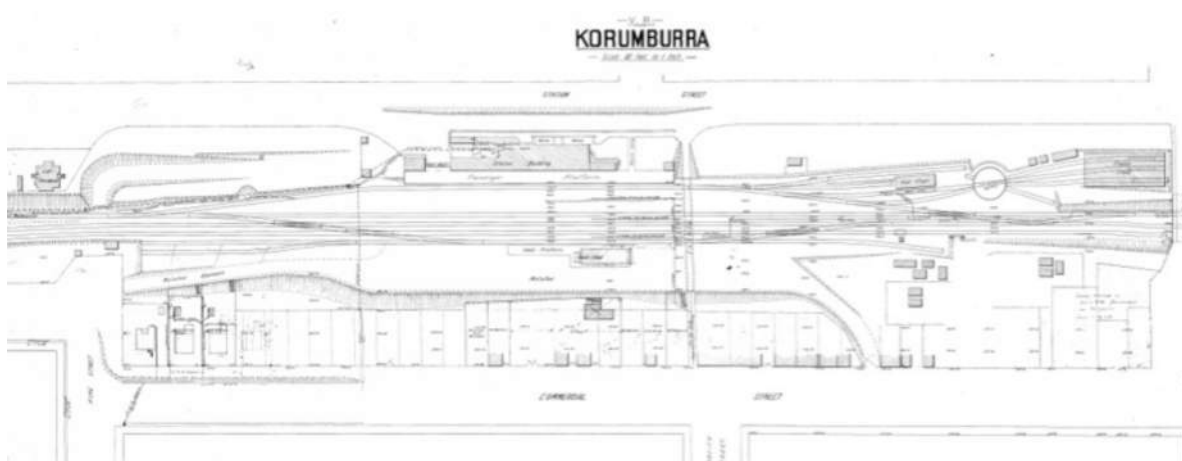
Plan showing layout of station in 1910, note the original location of the Goods Shed, opposite the main Station Building. (Source: Quadratum Architecture 2018)
